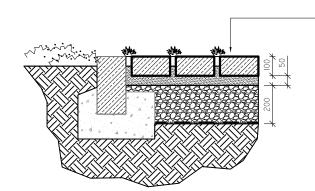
TYPICAL STONE PAVING TO PEDESTRIAN TERRACES & PATHS
